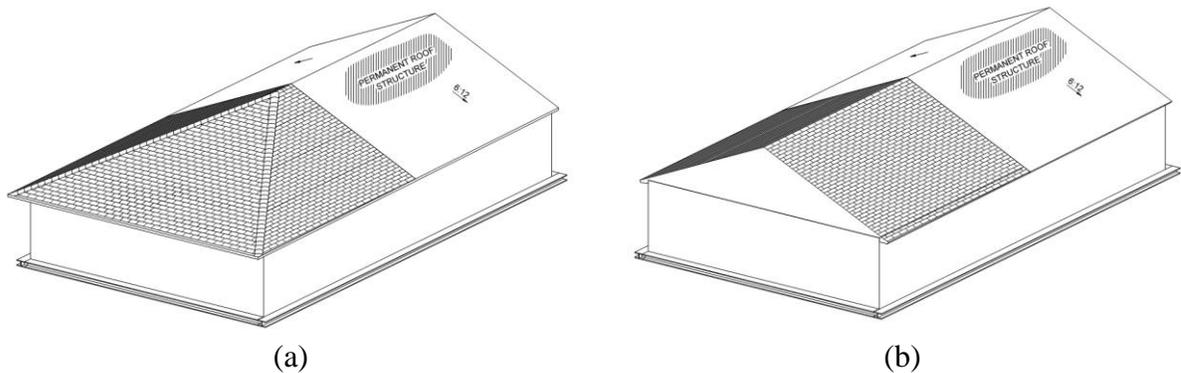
Roof sections installed on base structure (a) hip (b) gable
